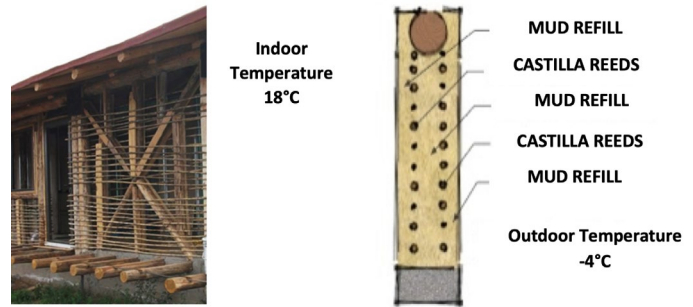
Multipurpose Room in the construction stage. Detail of wattle and daub wall assembly. Source: Preparation by the authors.
